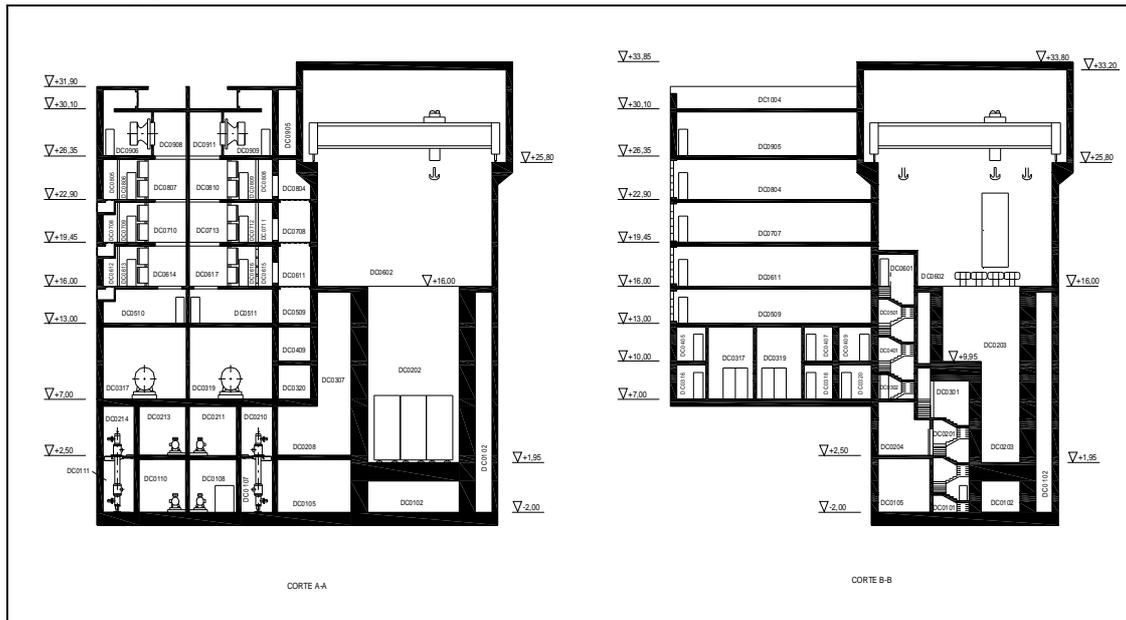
Spent Fuel Complementary Storage Building – Cross Sections
